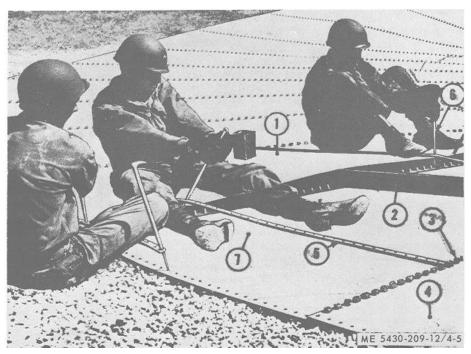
Installing wedge gaskets before installation of last bottom plate.
